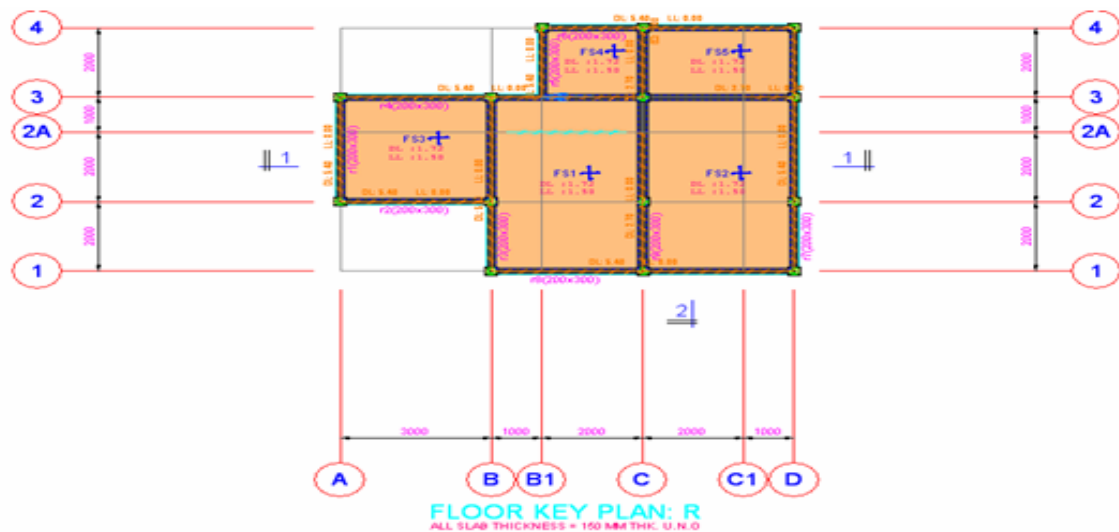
Building Plan which consists of Solid Slab, Beam, and Column
